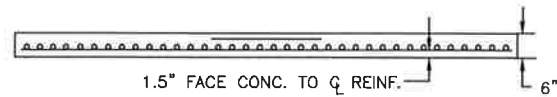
DETAIL OF TOP SLAB, REINF. STEEL CLEARANCES REQ'D.
